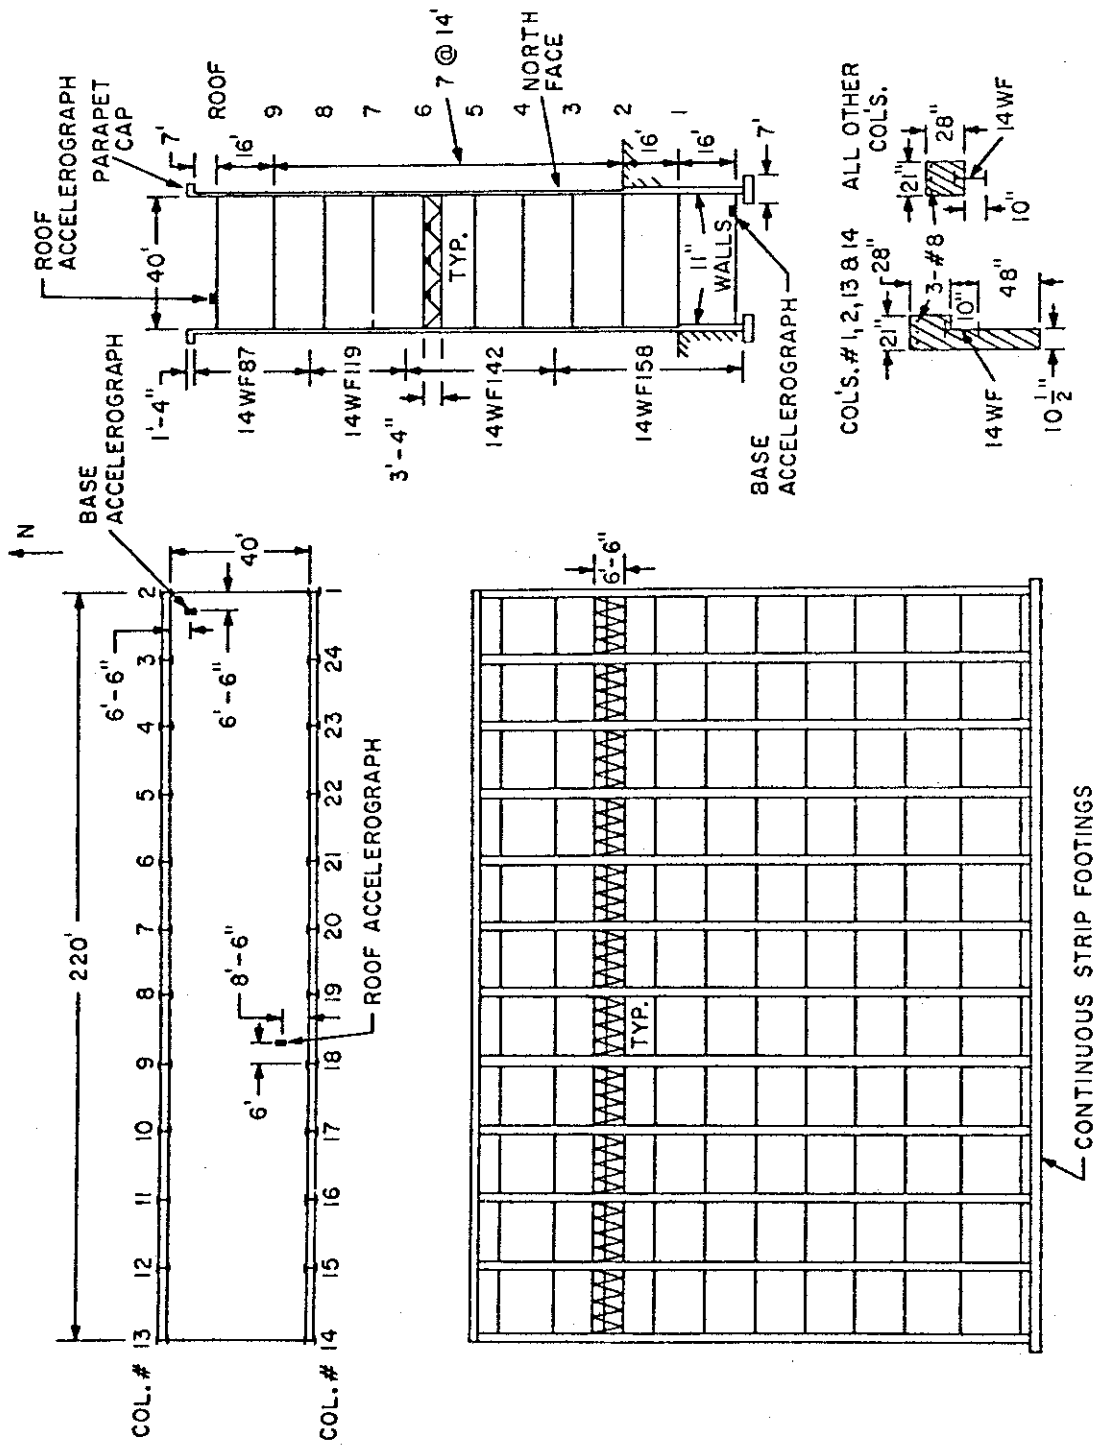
Typical floor plan and longitudinal and transverse sections of JPL Building 180 (from Foutch et al. [4]).
